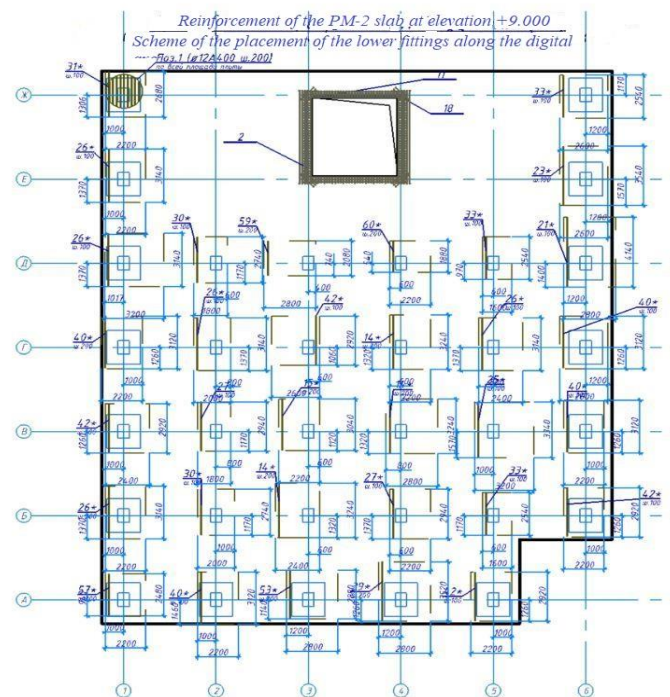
slab reinforcement PM-2 at elevation +9.000. Layout diagram of top reinforcement along numerical axes
